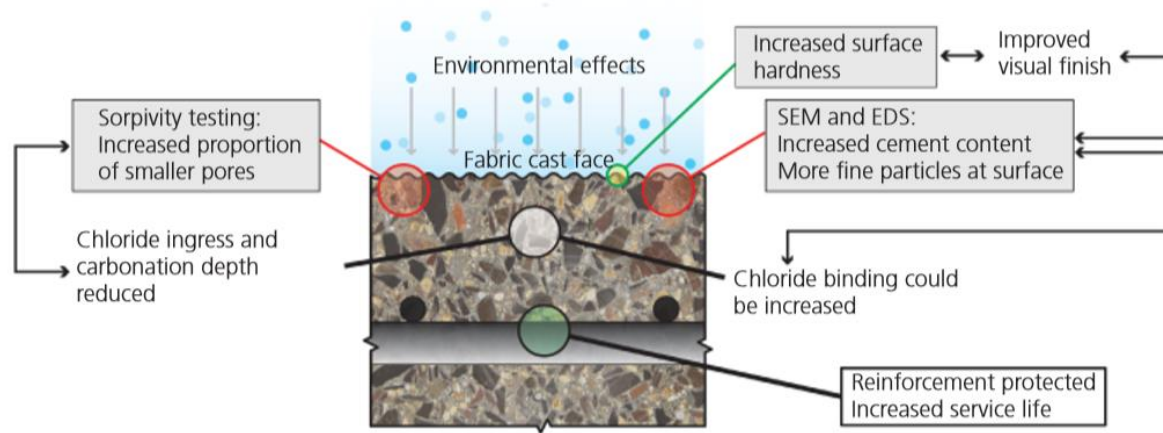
Proposed effects on the surface zone of concrete cast in fabric formwork (Orr *et al.*, 2013).
